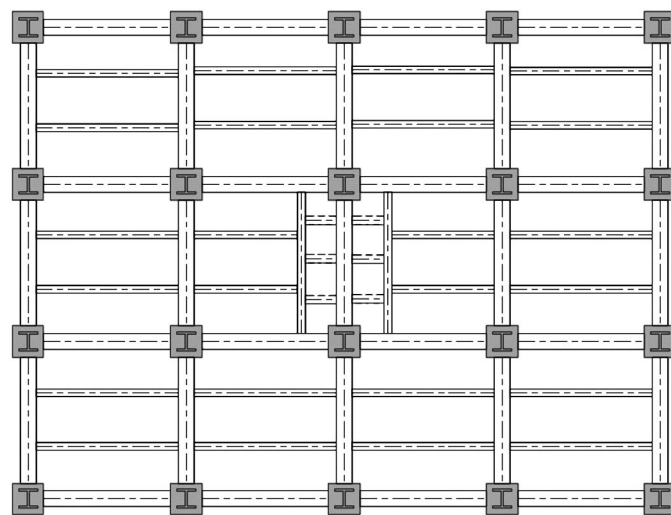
Typical framing plan for a multistory steel-framed building (reprinted with permission from Kamat and Martinez 2002)
